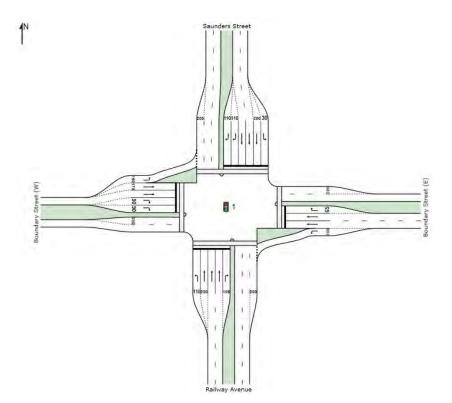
Proposed year 2033 layout for the intersection of Railway Avenue, Boundary Street and Saunders Street Table 5-7: Summary of SIDRA assessment of Railway Avenue, Boundary Street and Saunders Street Intersection
